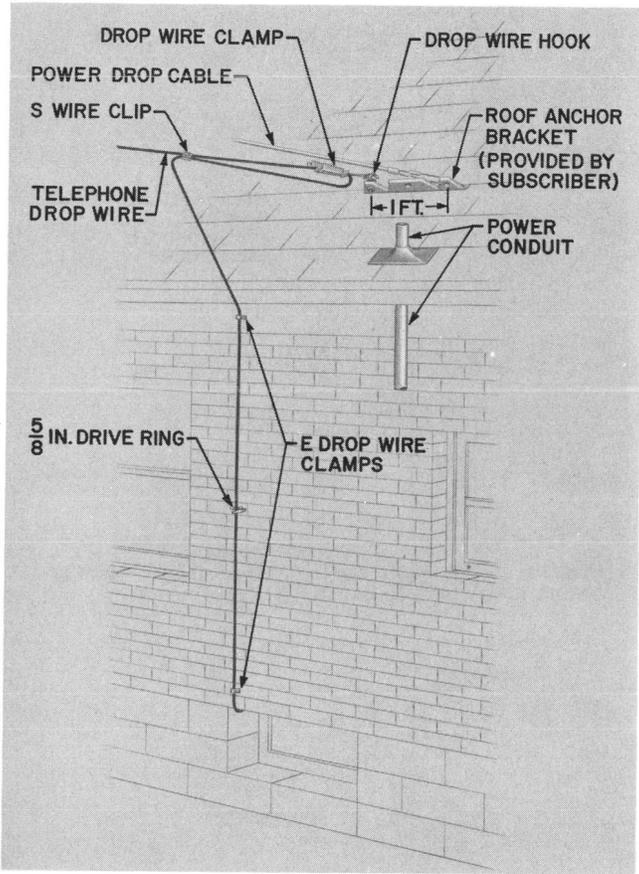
Drop Wire and Power Cable Attached to Roof Anchor Bracket
